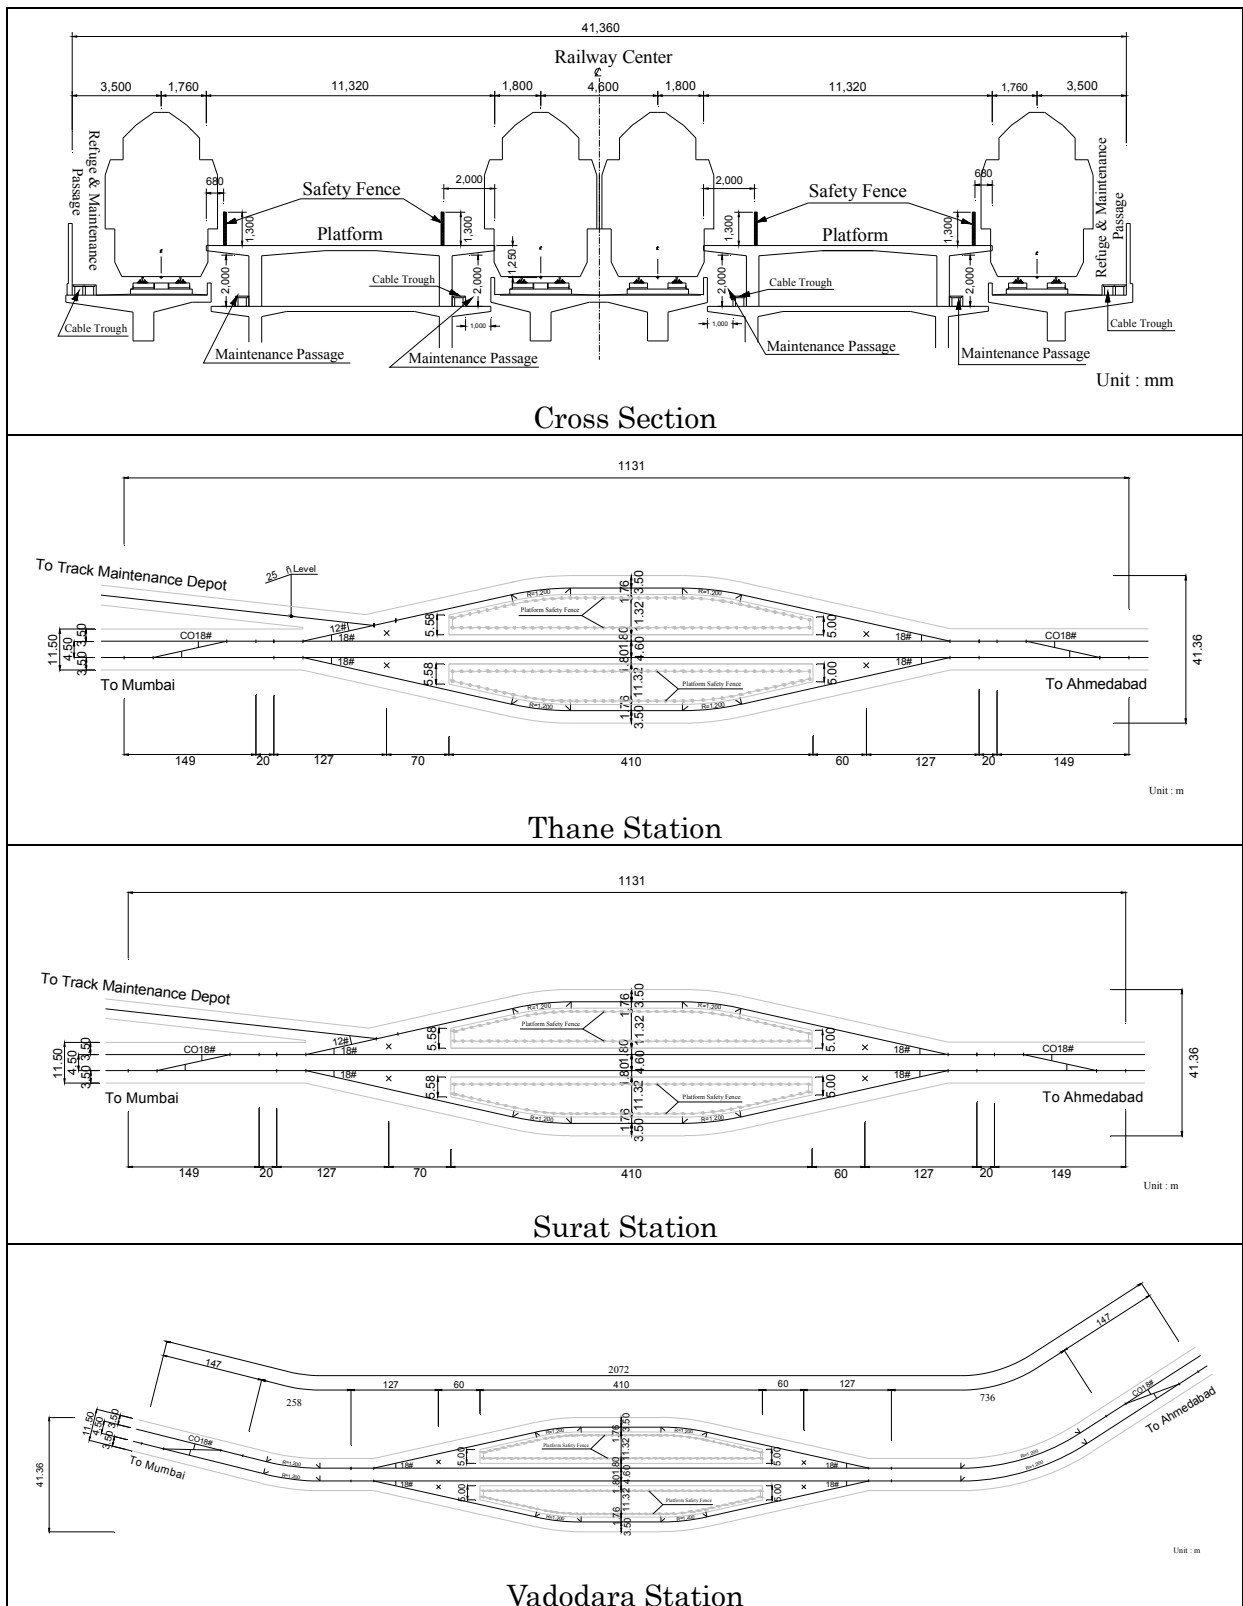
(1) Drawings of the Cross-section at the Center and Schematic Drawing of the Track Layout of Different Stations
